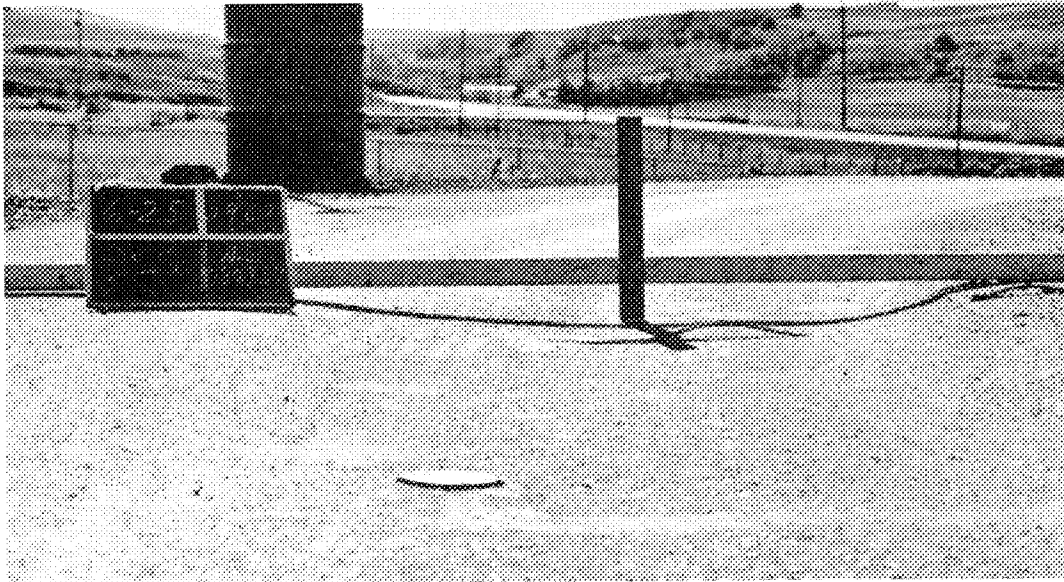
CONTINUED SETTLEMENT OF THE PAVEMENT IN SECTION 3
